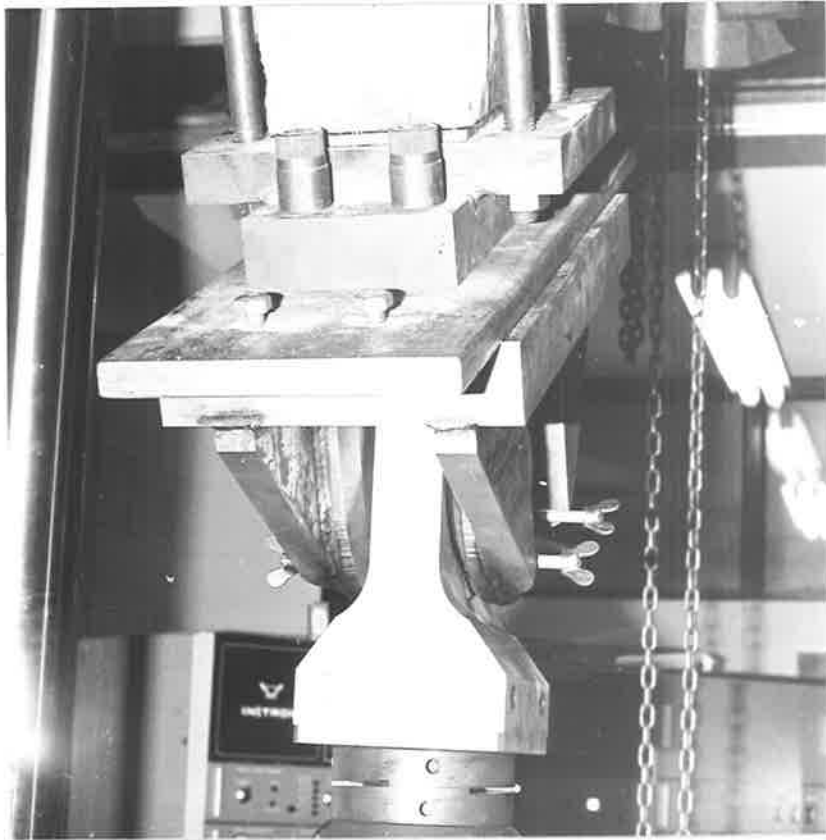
(b) View of the connection (E) between the testing machine actuator and the lower column of the specimen.
